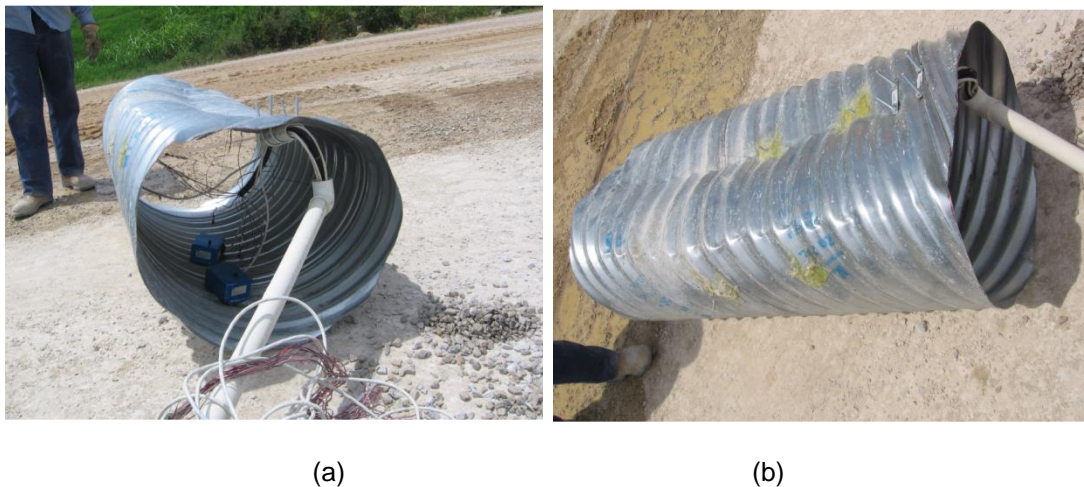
CMP 24 in. Pipe after Testing. (a) Top View. (b) Side View
